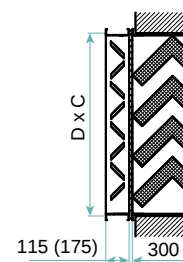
SWG 300 damping ventilator with a multileaf damper installed.
